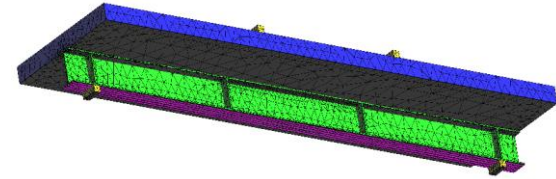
FEM model of the CFRP strengthened steel-concrete composite beam
